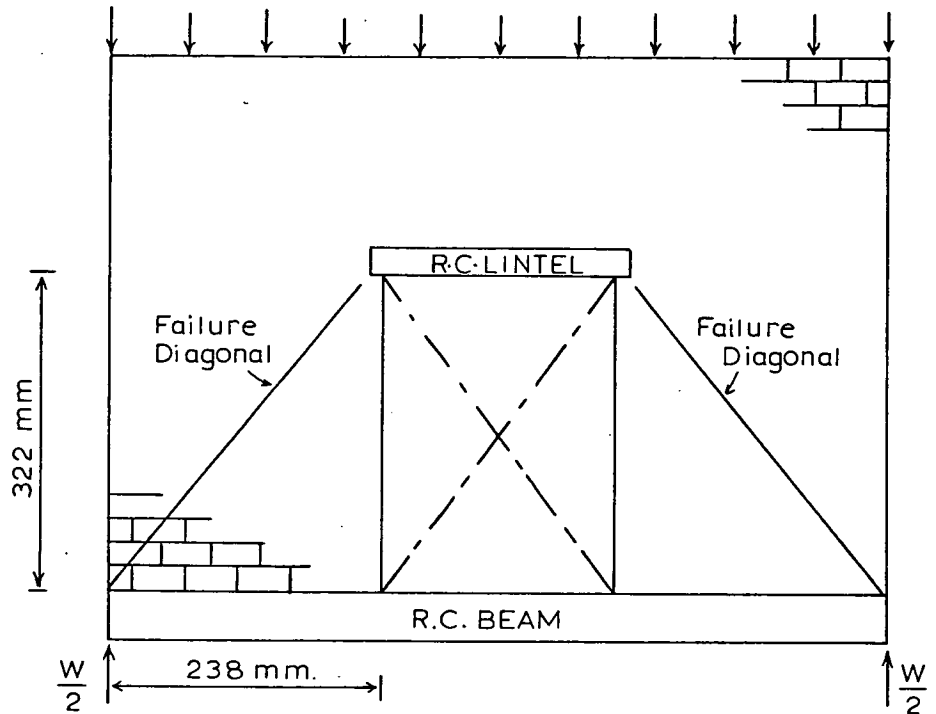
FAILURE DIAGONAL IN WALLS (7 a,b)
